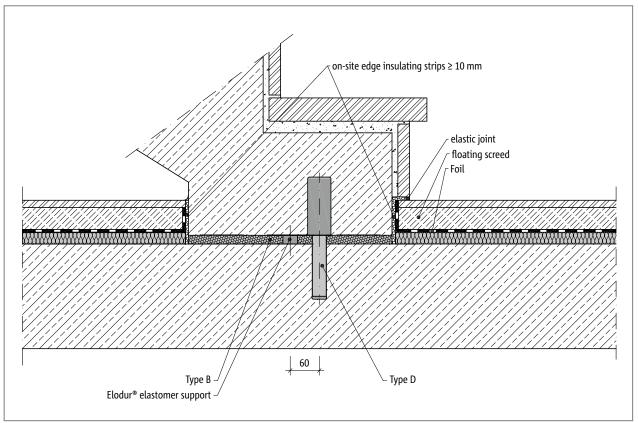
Schöck Tronsole®Type B + type D: Installation cross-section
